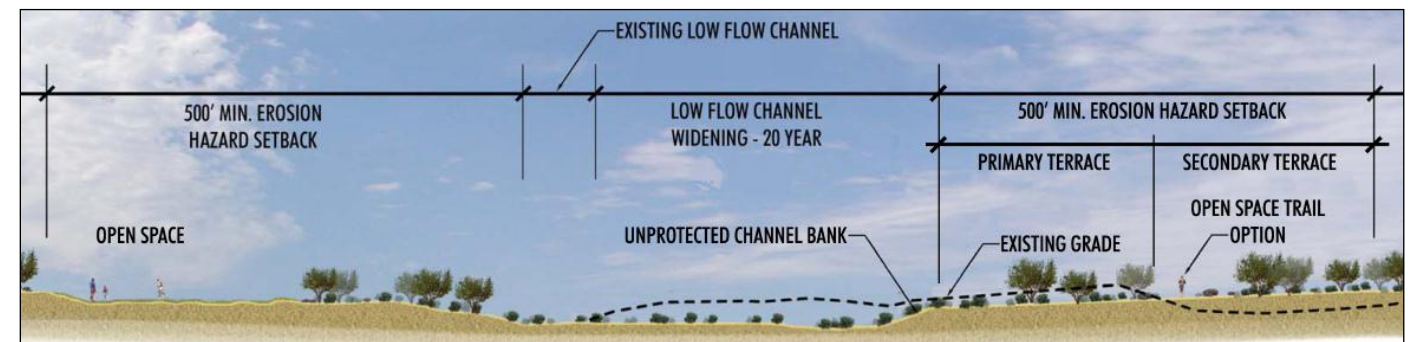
Artist’s rendering of River Master Plan concept single-terrace cross section
